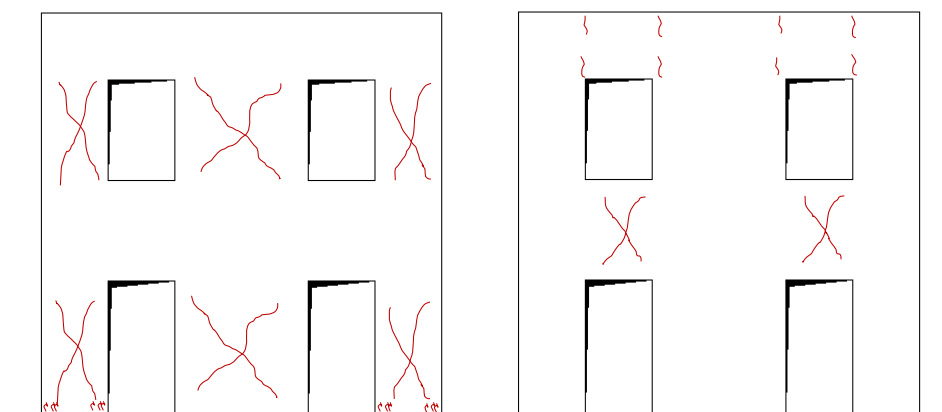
Failure mode of a masonry wall with a damage concentration in pier (a) or spandrel elements (b) respectively.
